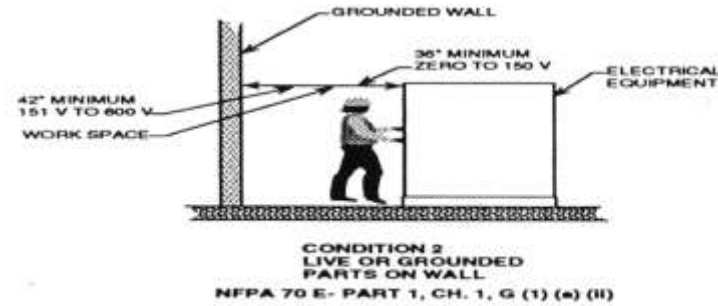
Clearance in front of electrical equipment with grounded wall opposite equipment.
